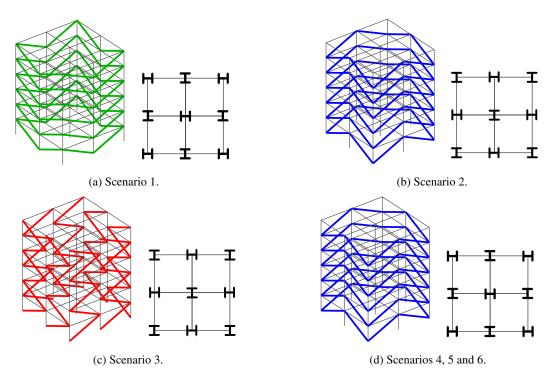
Non-dominated extracted solutions 3D and plain view, detailing the bracing system configuration and column orientation.
